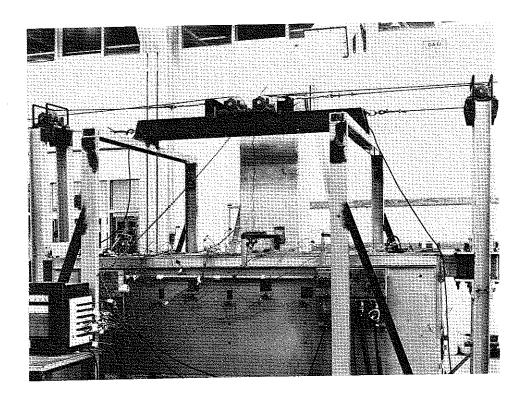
Picture of the switching construction for the upper end of lever arms, which enables the forces in the wires to be directed toward the furnace and render a positive restrained bending moment.
